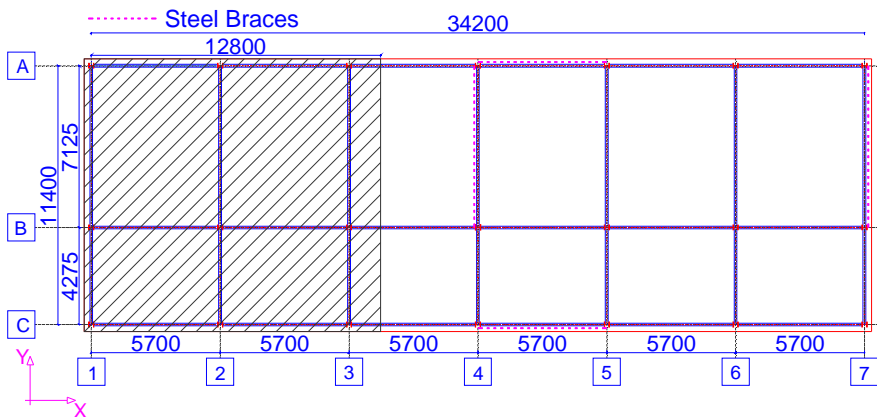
Floor Framing Plan - Asymmetric Configuration (dimensions in mm)
